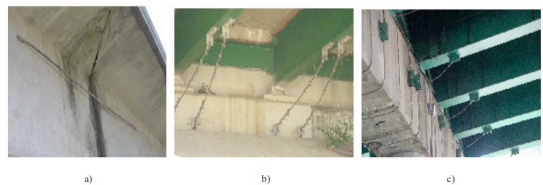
Restrainer cables (a) in Kentucky connecting two adjacent girders; (b) in Tennessee (SR59 over I-40) connecting girders to the abutment; and (c) in Illinois attached to girders and wrapped around bent beam
